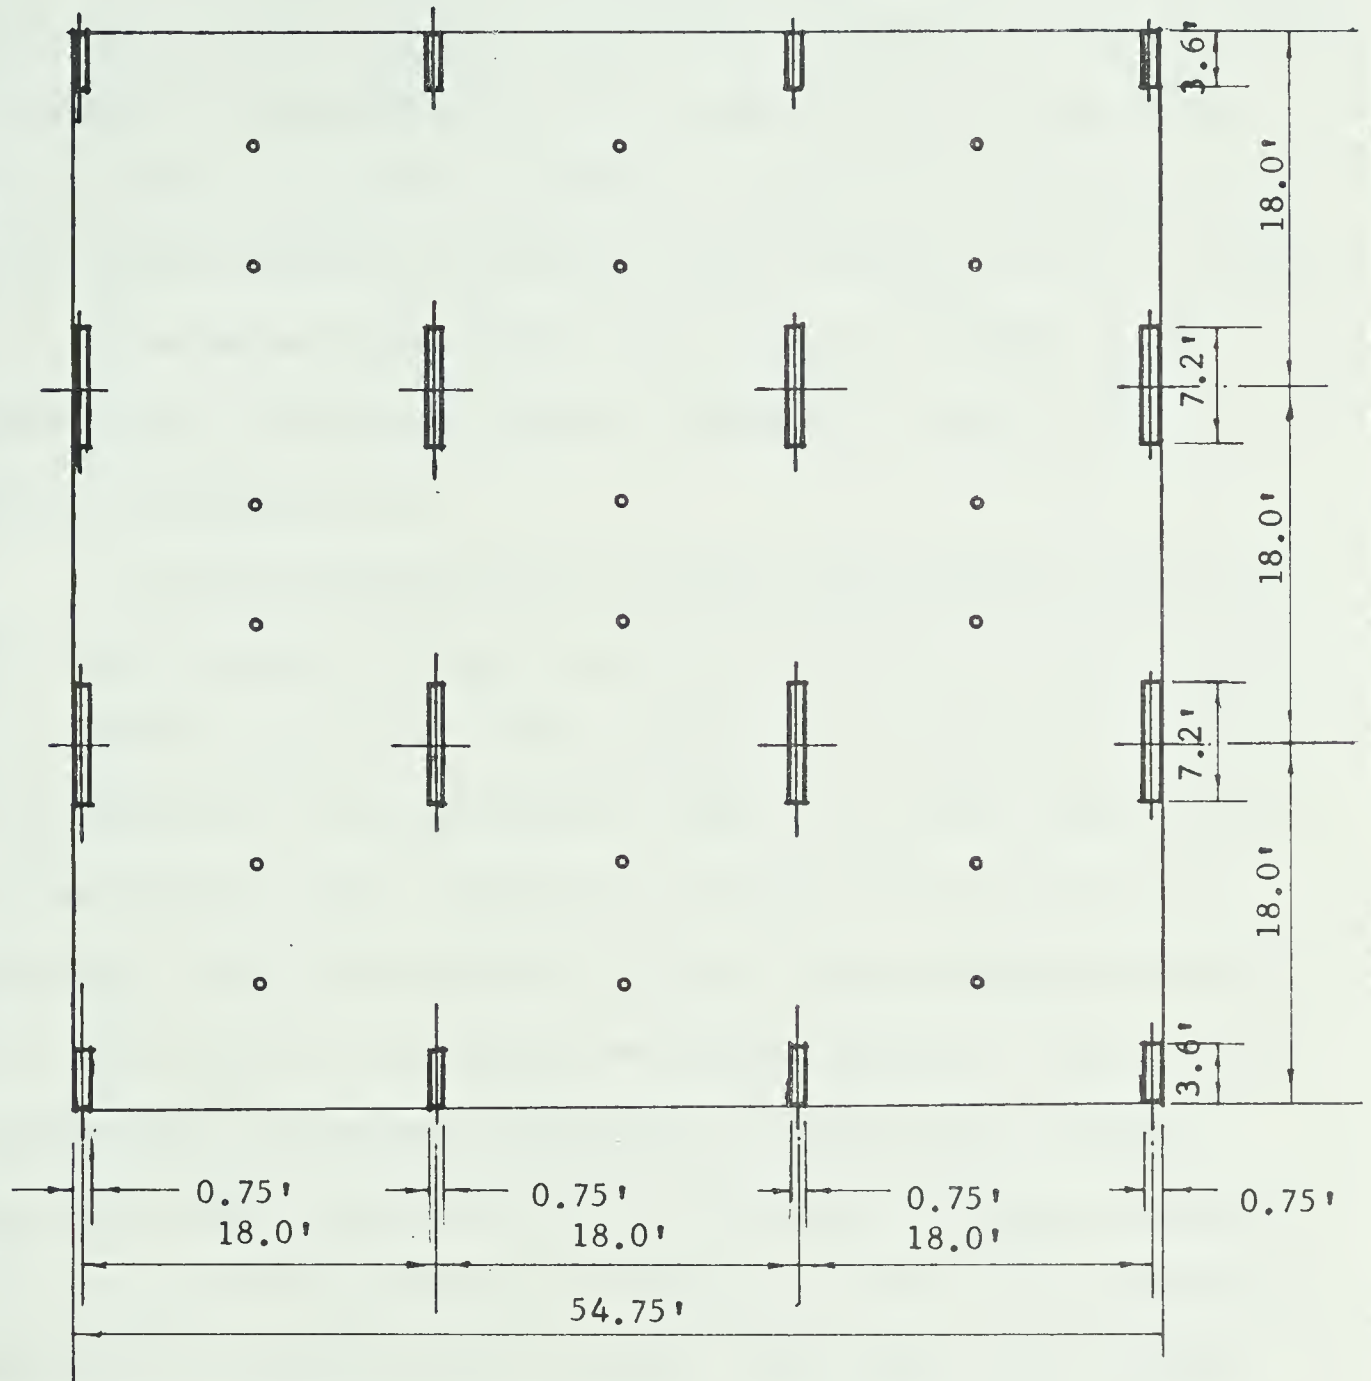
PROTOTYPE SLAB LAYOUT
